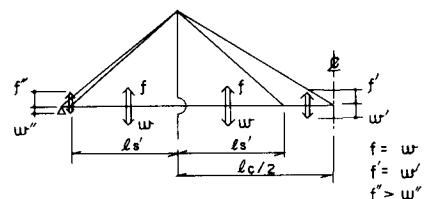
Equilibrium between Cable Force and Girder Weight for Whole span
